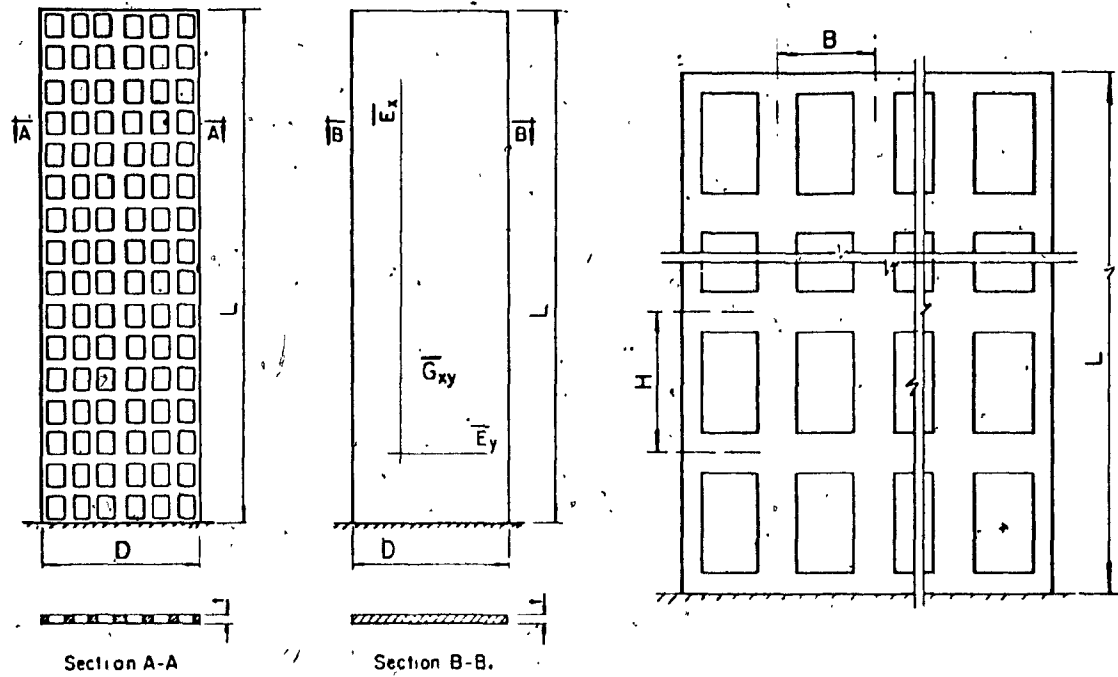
GEOMETRY OF A WALL-FRAME, [22]
